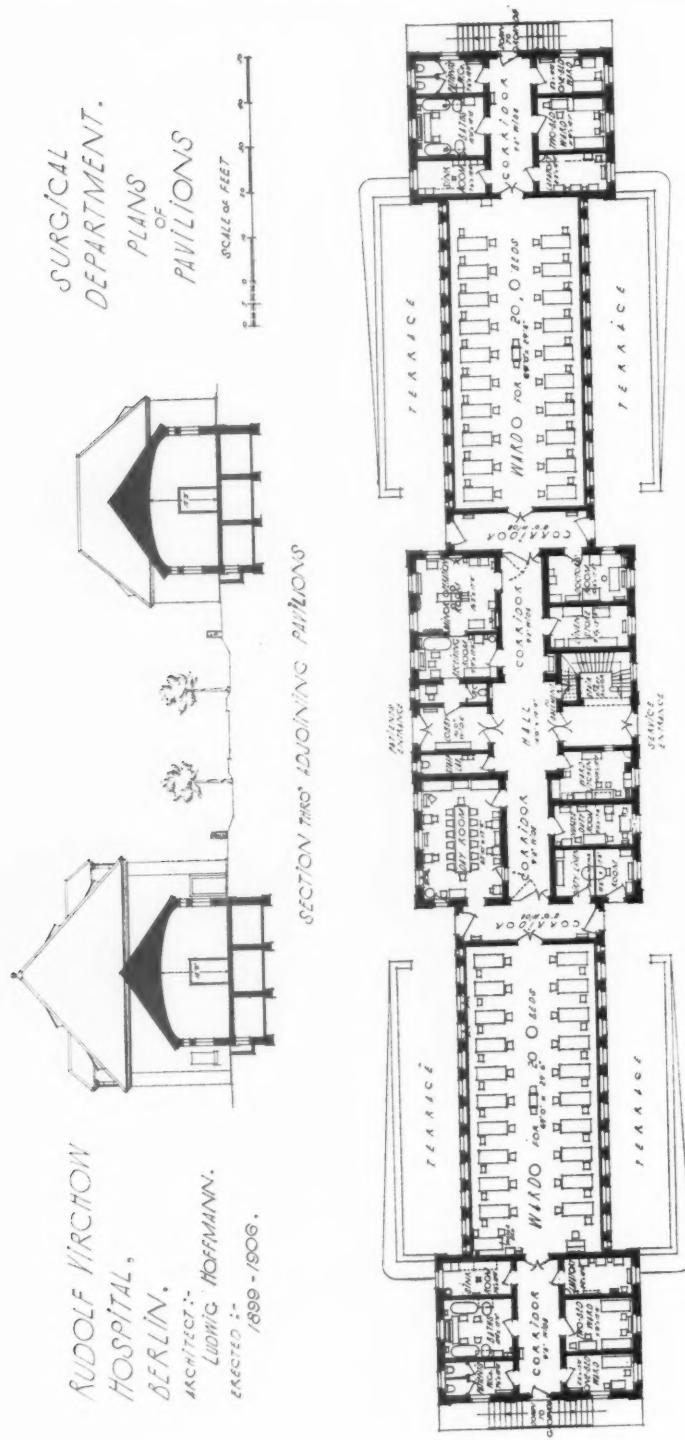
GROUND FLOOR PLAN OF SURGICAL PAVILION, THE VIRCHOW HOSPITAL, BERLIN.
